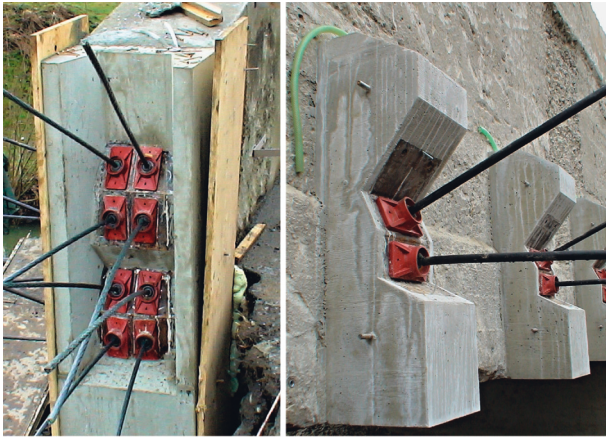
Realization of the additional anchorage areas of both main girders and cross girders. In this implementation, a new type of encapsulated single-strand anchors was used (2008). The anchors are covered and protected in concrete extensions [23].
